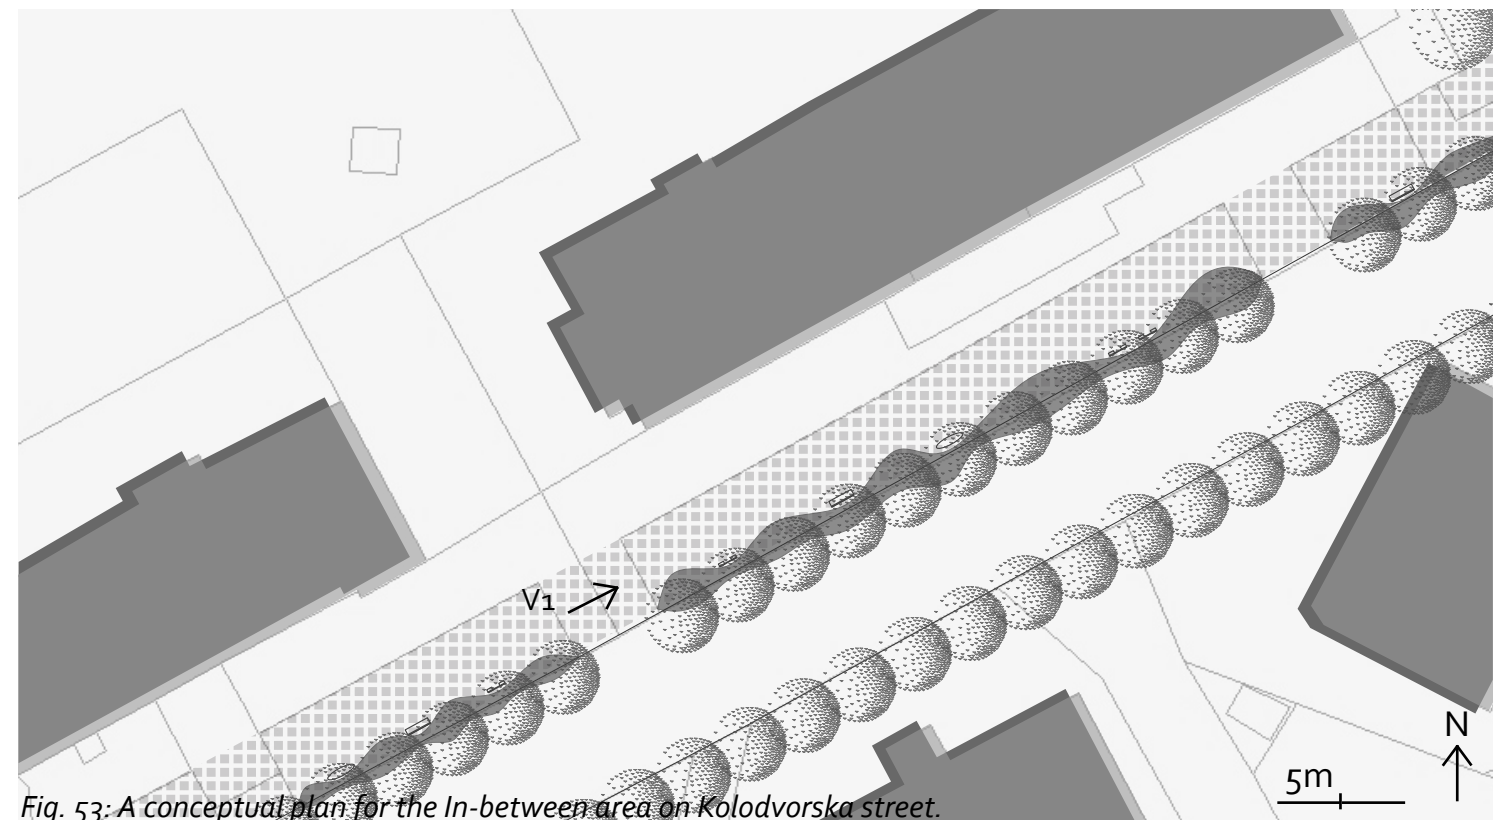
A conceptual plan for the In-between area on Kolodvorska street.
